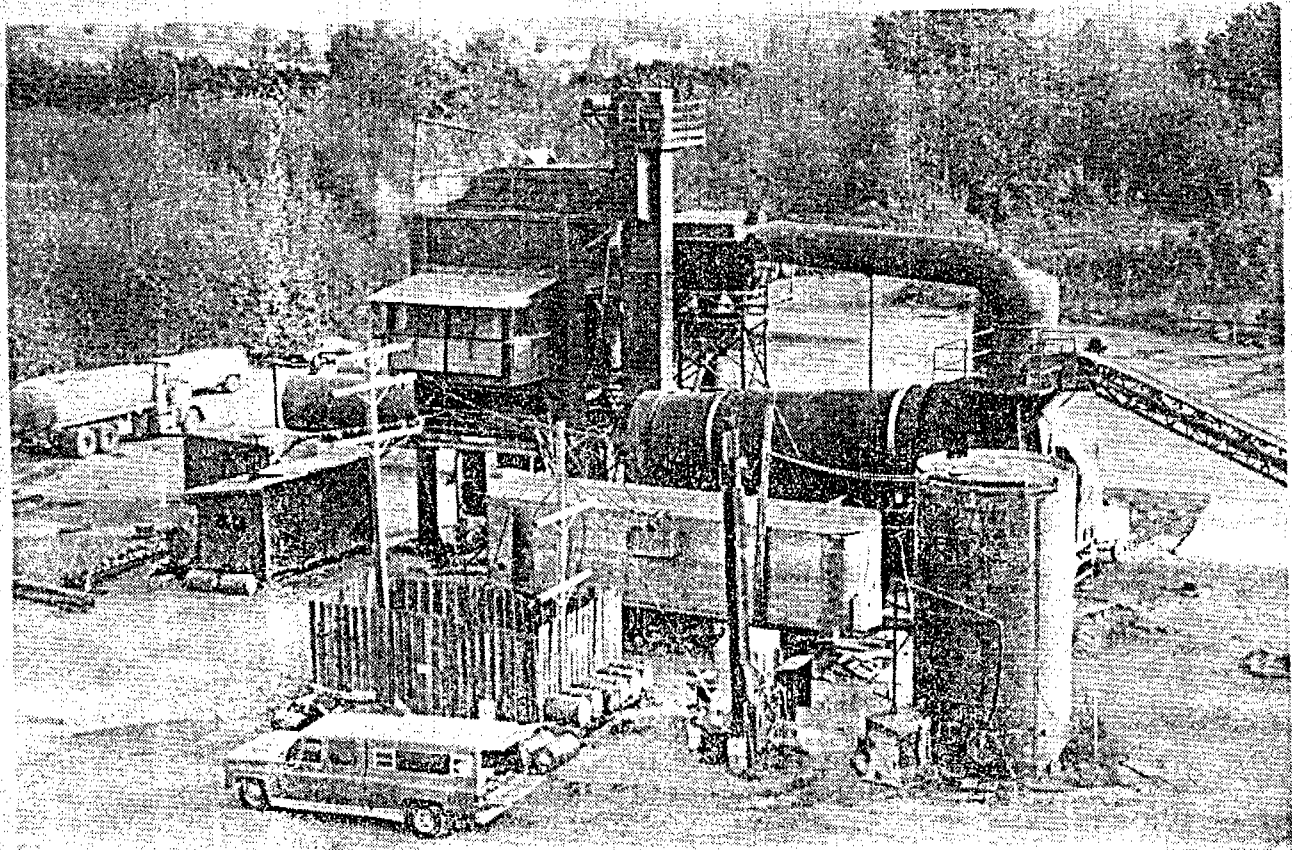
View of the asphalt batch plant at Mercer-Fraser's yard at site #5.
